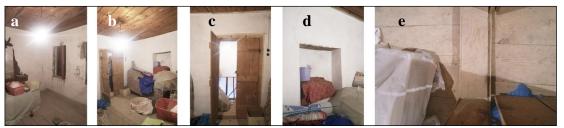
23. First Floor a. Room2; b. Room (H); c.,d.,e. Door with two wings, alcove and wooden floor details (S.Sevimbige archieve, 2017)
